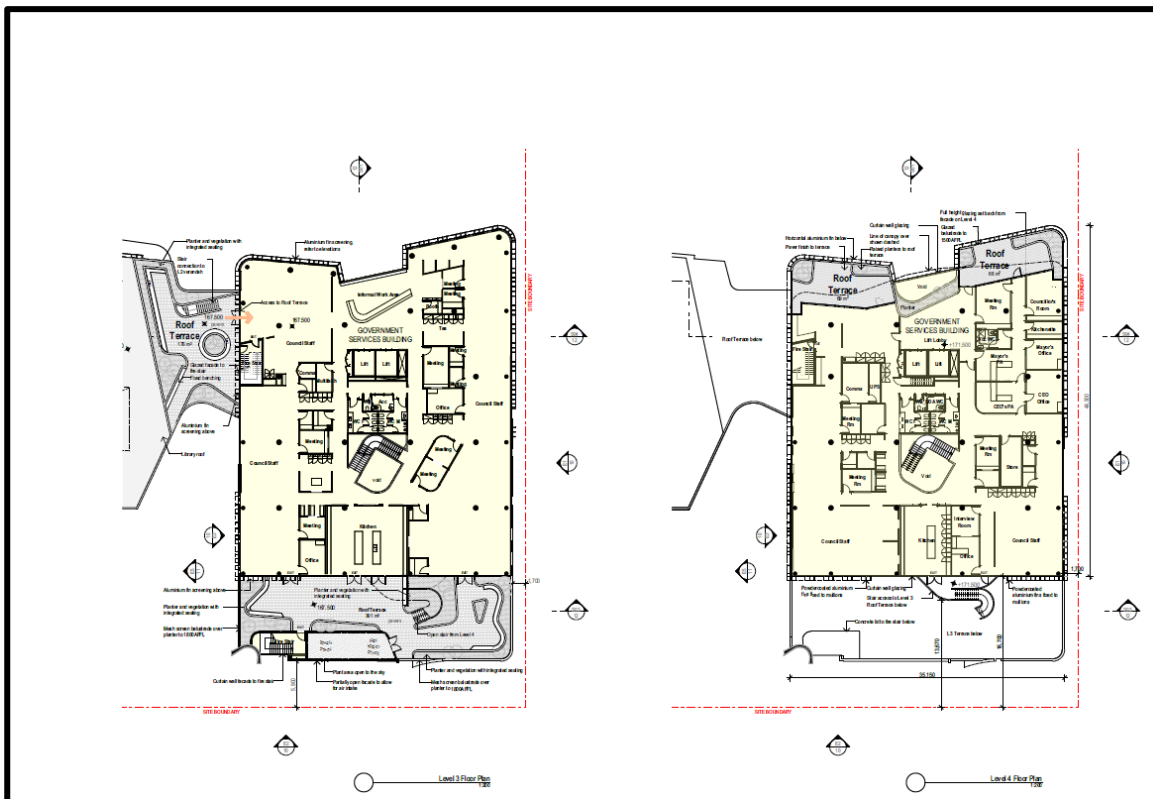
Proposed Second and Third Floor (Source: William Ross Architects)
